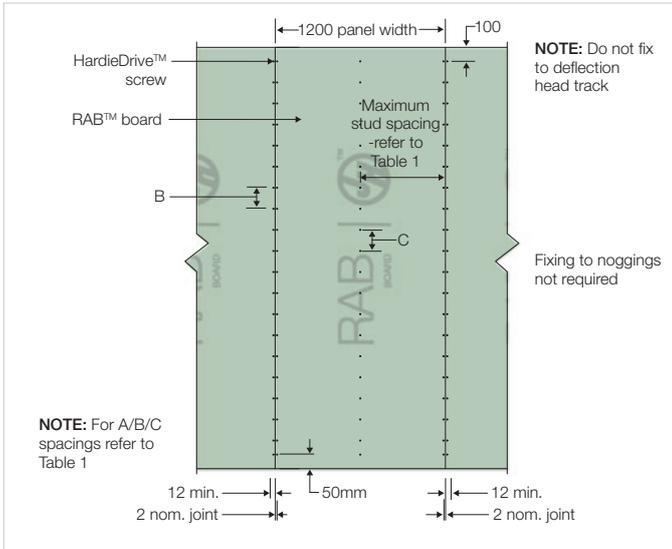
FIXING LAYOUT (NO BRACING CAPACITY)
